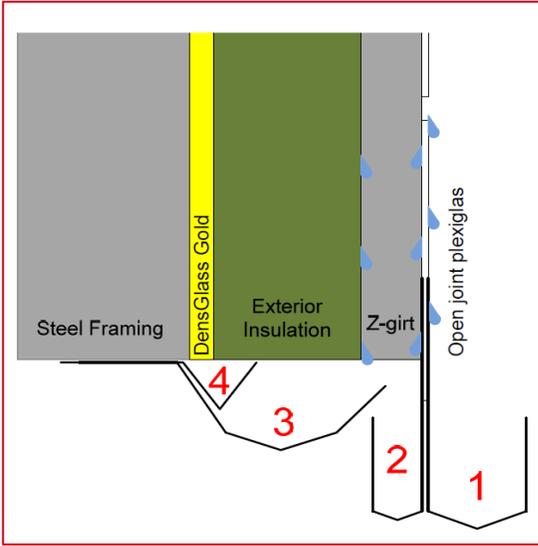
ROCKWOOL CAVITYROCK® DD test wall assembly
